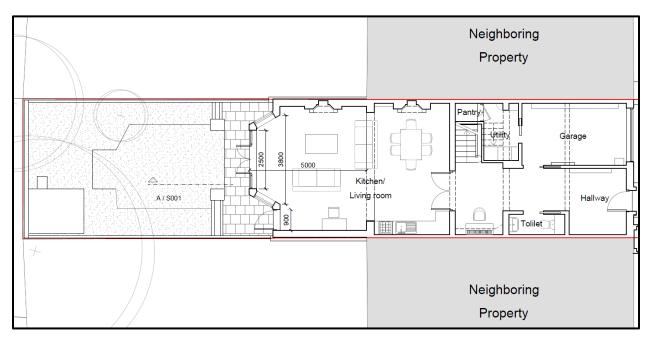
Proposed Ground Floor Plan - 3a Priory Terrace
